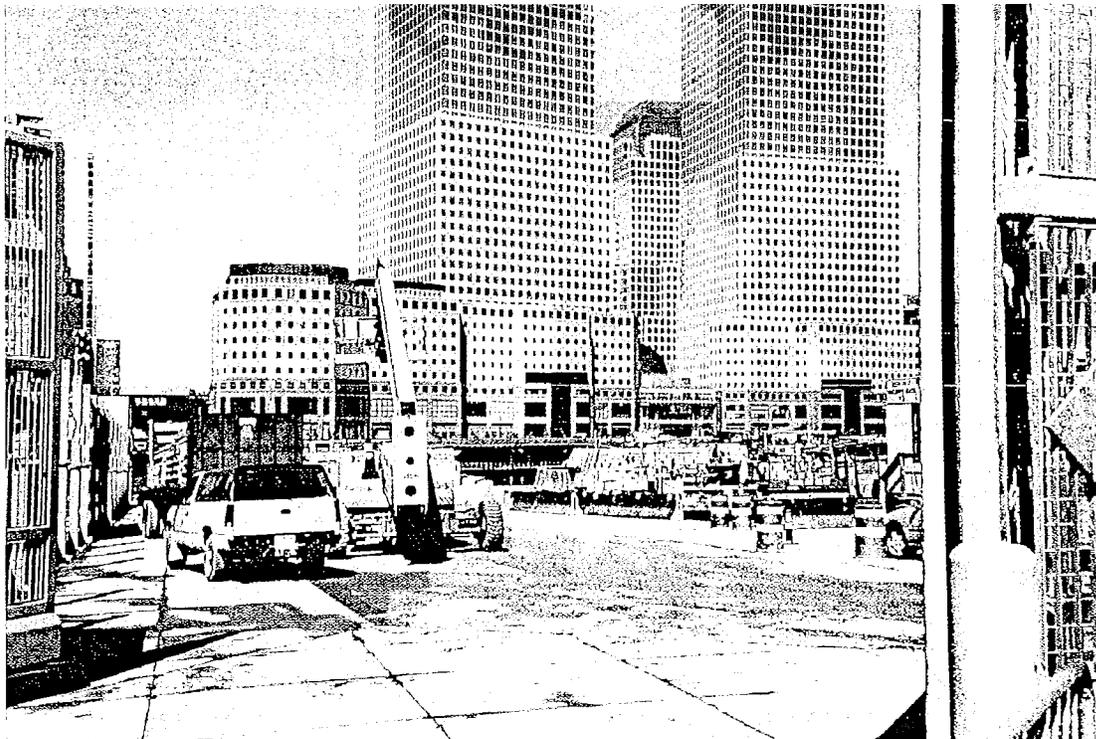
Footprint of WTC Building 4, looking southeast. Intersection of Liberty and Church Streets in background.
